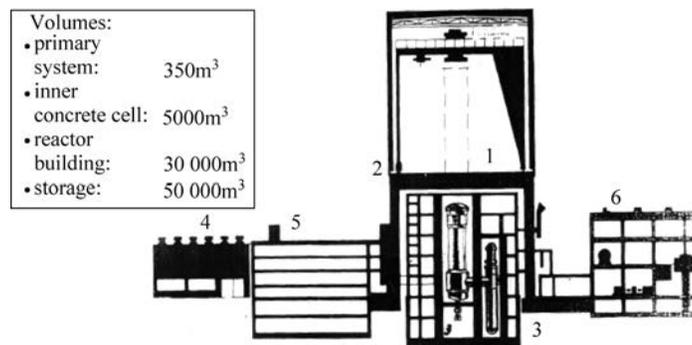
Arrangement of buildings of a HTR plant with two modular units
